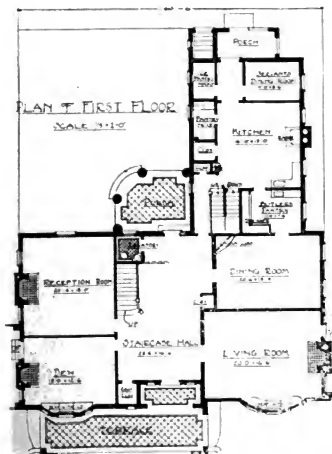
FLOOR PLANS OF RESIDENCE AT DALTON, MASS.
